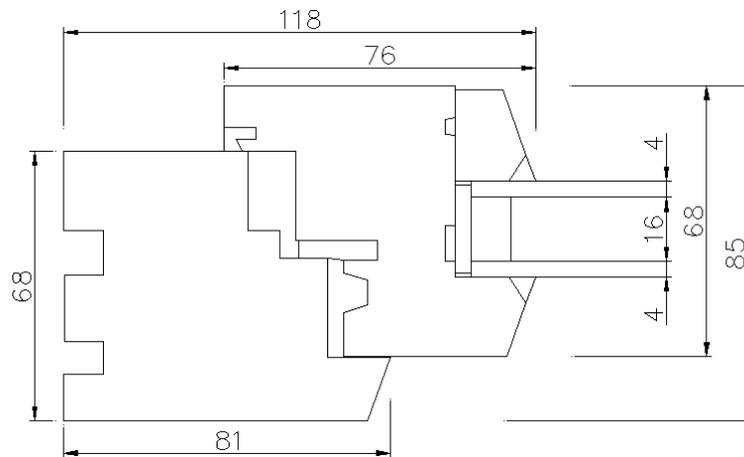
Horizontal section of a window system typically used in Hungary (sizes in mm)
